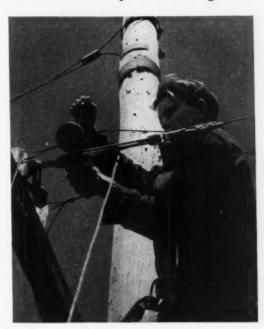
Rolling the sleeve to the wires with a rolling tool
